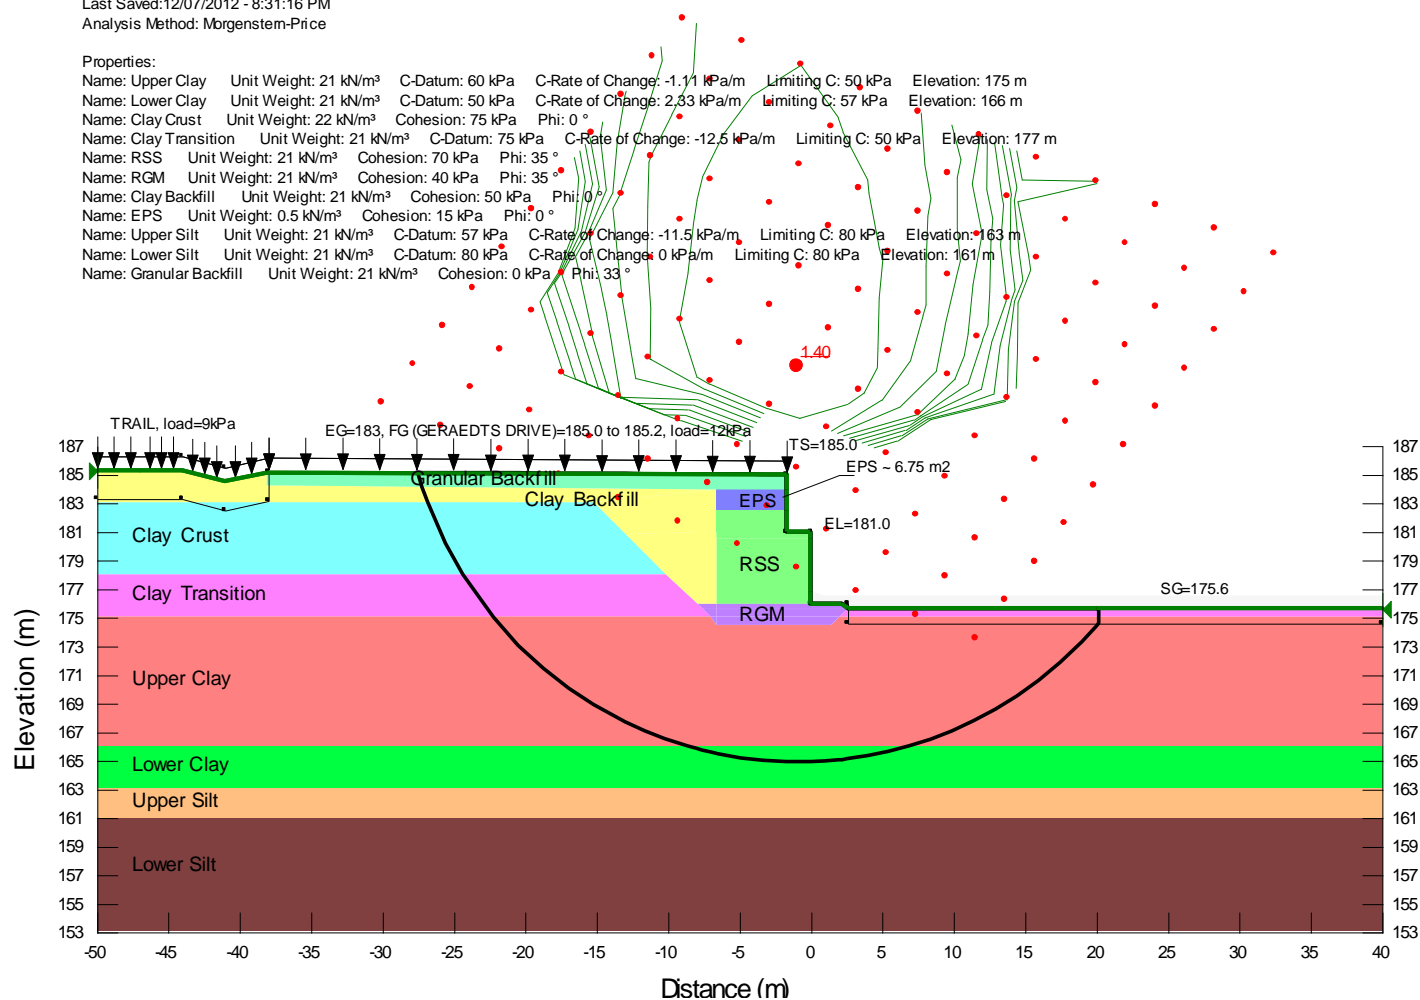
Global Stability Result – South Abutment (Geraedts Drive) – Short Term (Undrained) Loading with Sub-base
